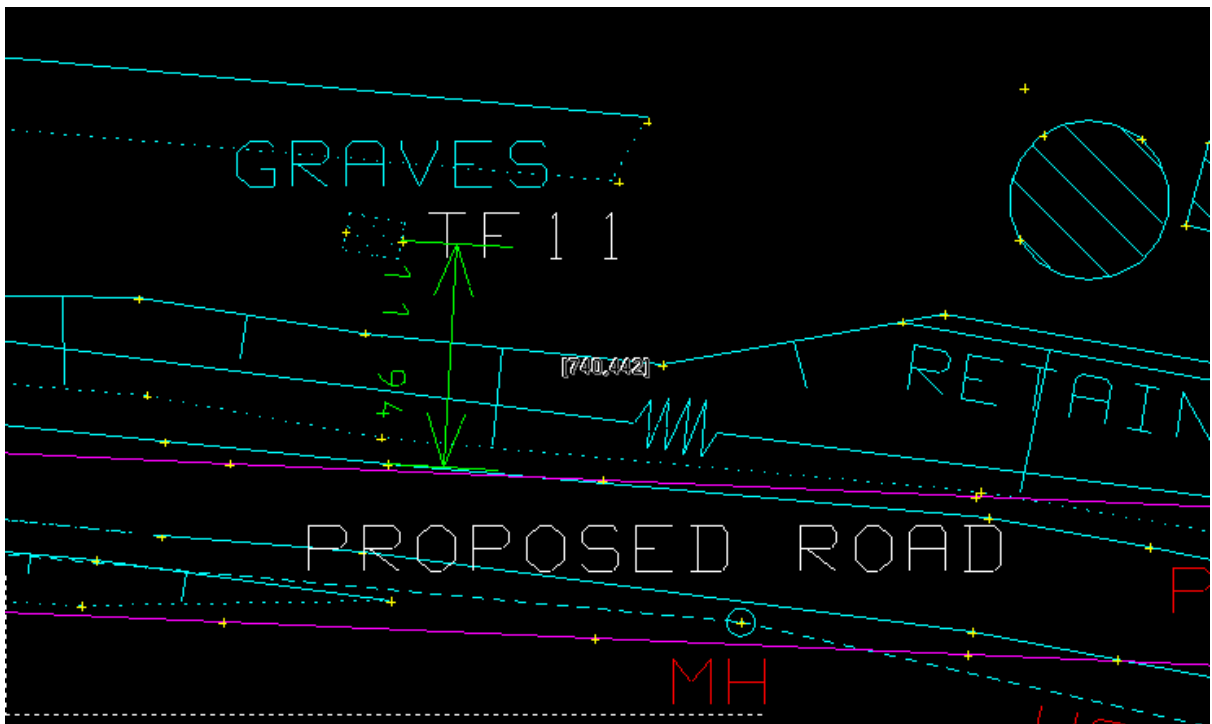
Position of grave site TF11 adjacent to the new road alignment (Source: Neil Brand)
